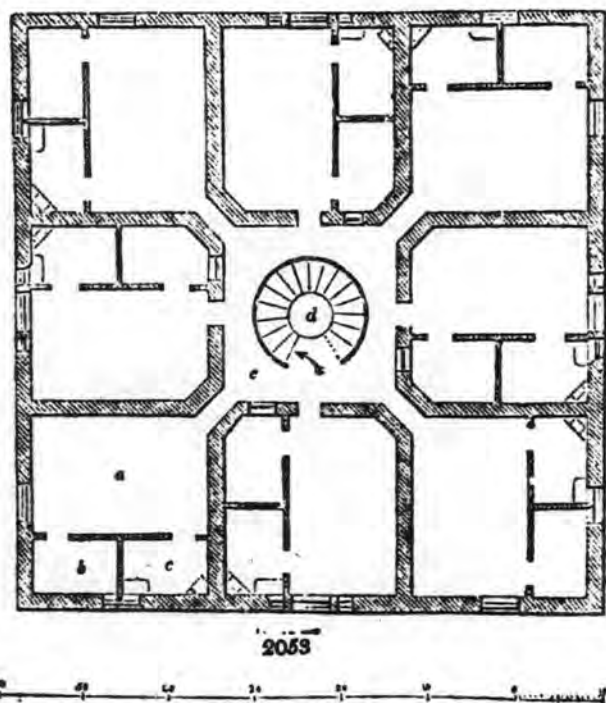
John Claudius Loudon. College for Working Men (project). Plan (*Builder*, 25 February 1843).
